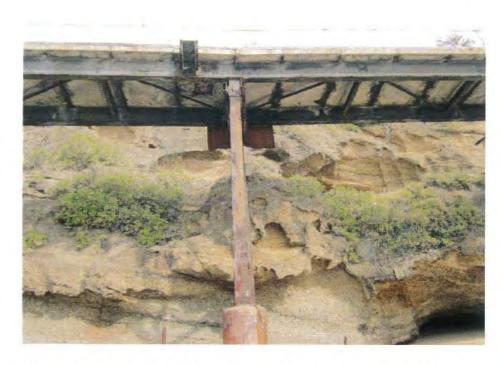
A view of the outer leg of the Bent shown in Photo 29. Note the rust staining on the concrete encasement.
